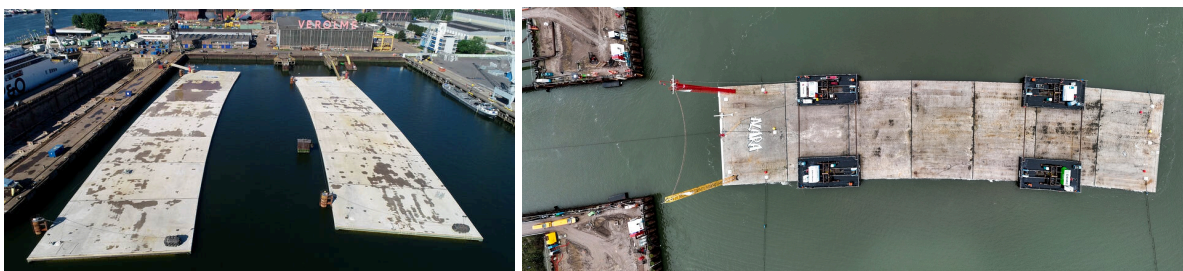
Tunnel elements in dry dock of Damen Verolme (left) and sinking of tunnel elements (Ballast Nedam, 2024)
